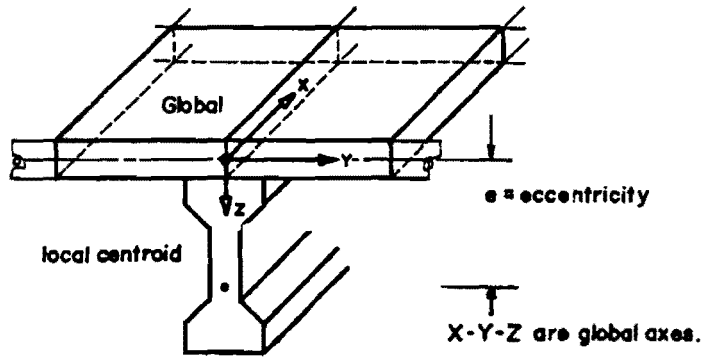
Eccentricity between girder centroid and slab mid-surface
